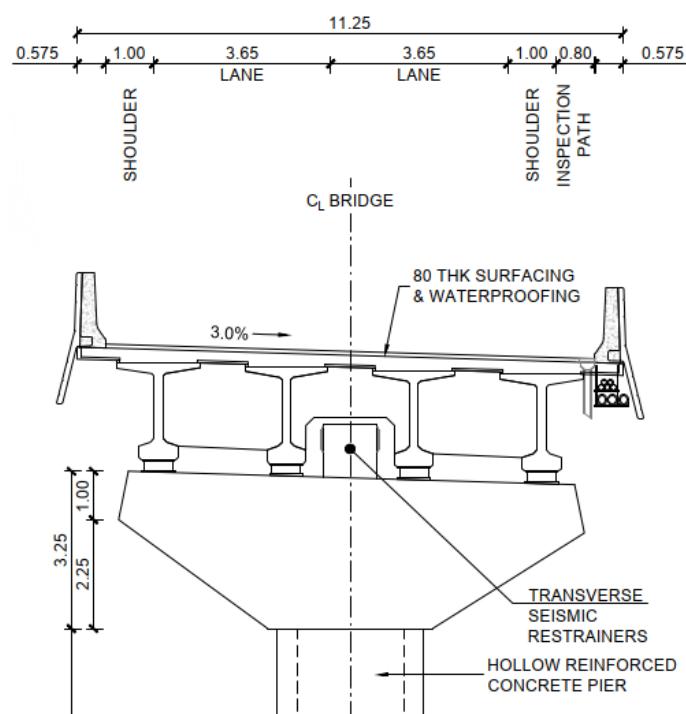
Proposed Approach Road Cross-section for Eastern Part-1, Ramps
